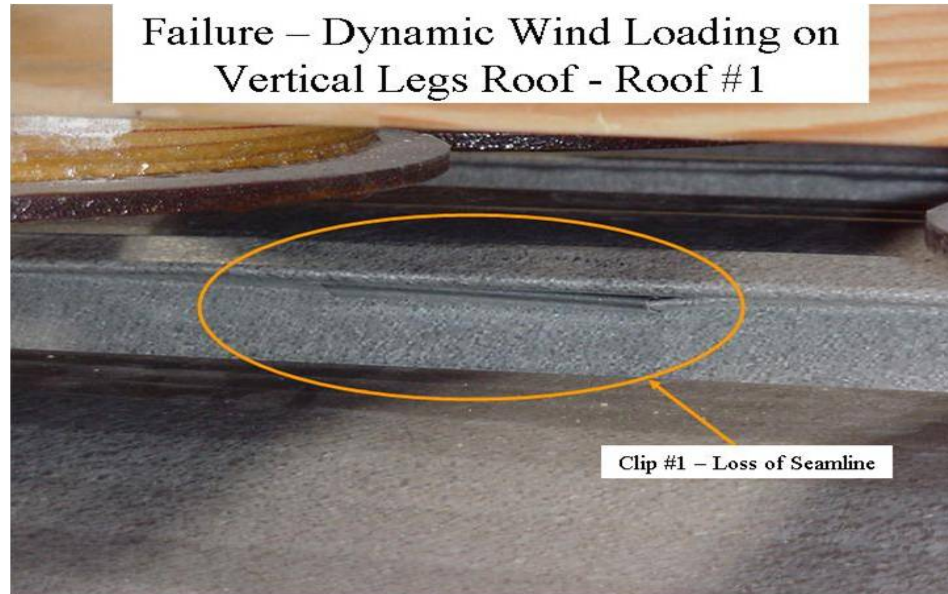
Failure of Clip #1 in Vertical Legs Roofs - Roof 1
